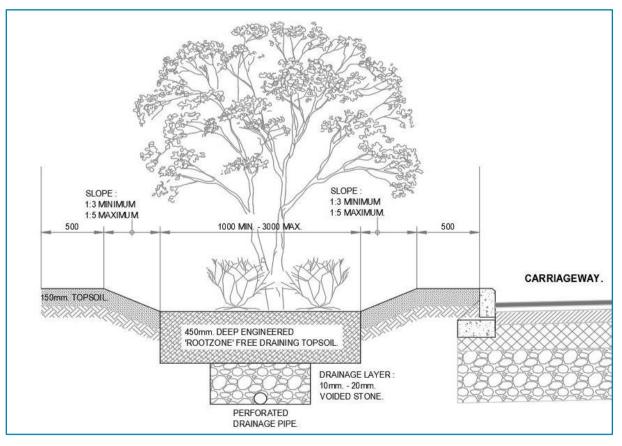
Cross-Section through Rain Garden incorporating 'Rootzone'.
